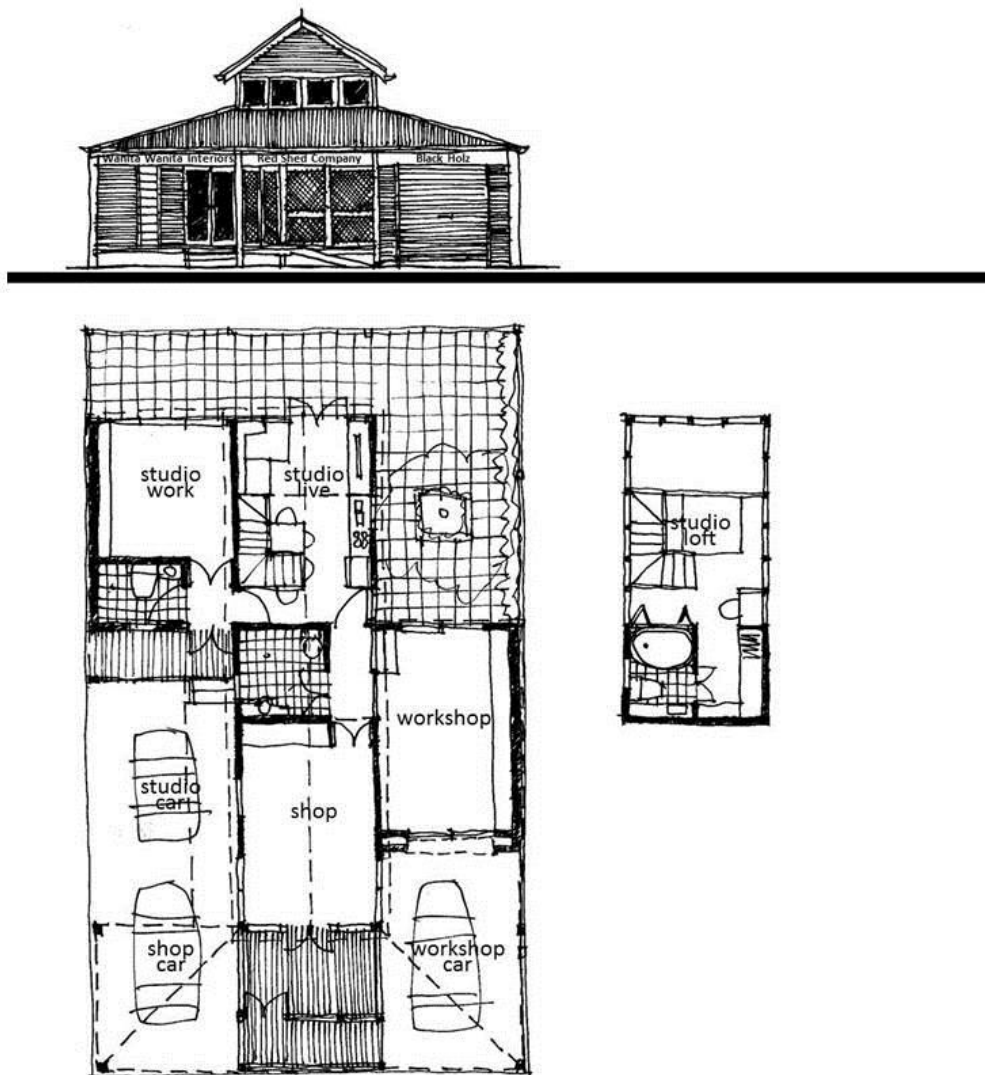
Preliminary concept building and site plan – 88 East Street, Clifton
